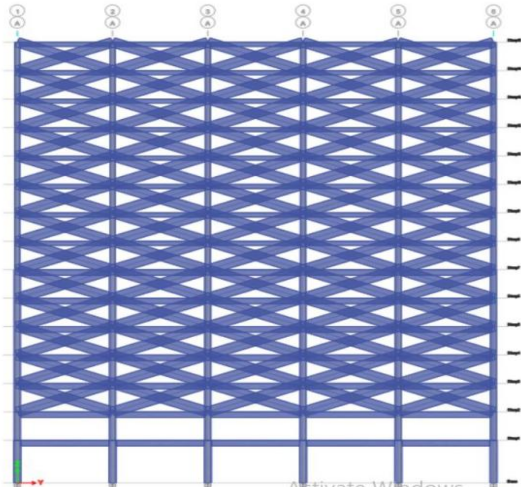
Elevation View — G+15 Building with Confined Masonry Infills (ETABS)
